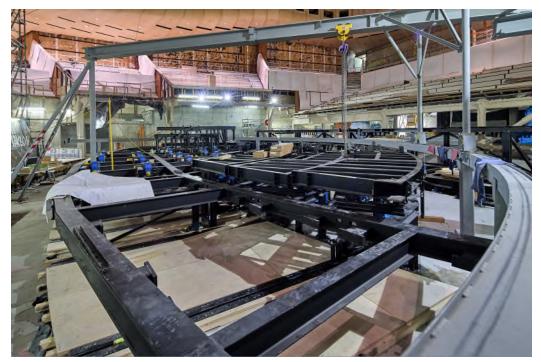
Installation of Concert Hall Stage Machinery (13 January 2021)
